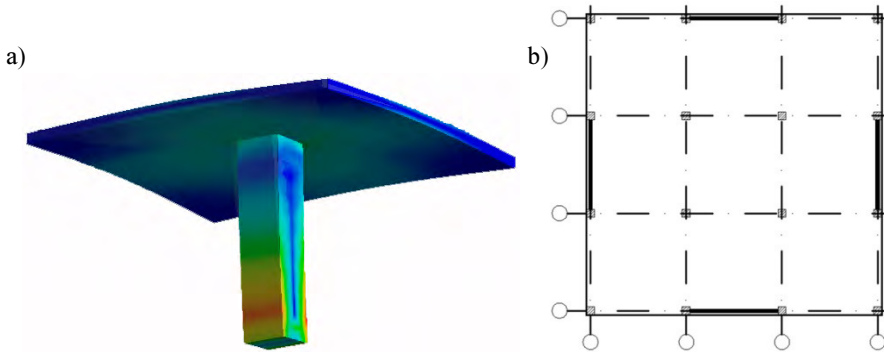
Flat plate system: a) 3D view of flat plate system, b) plan of the flat plate building with shear walls
